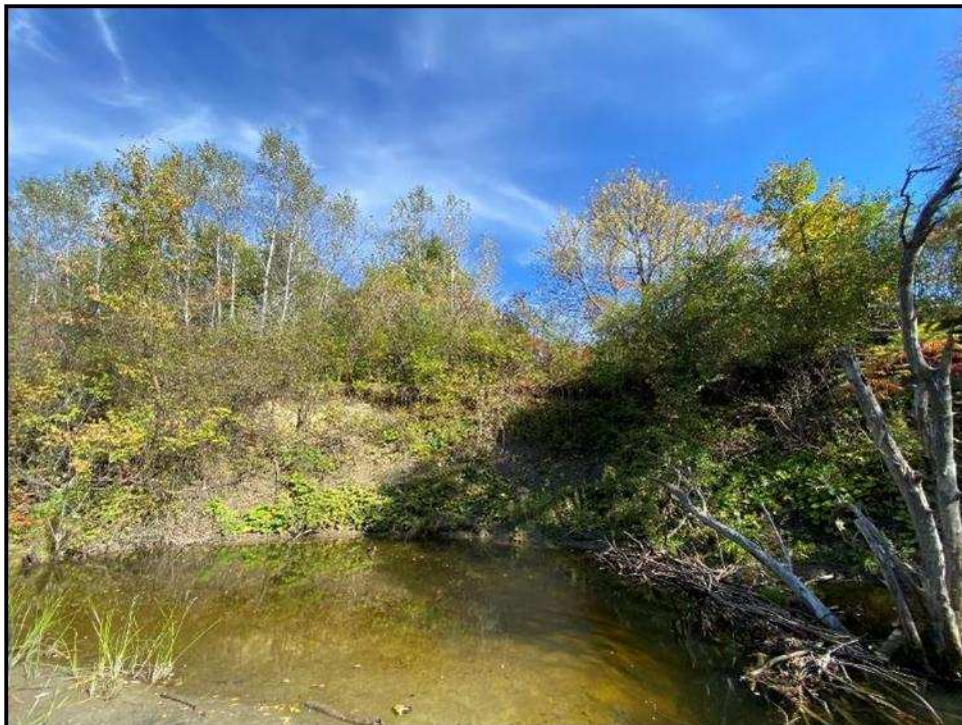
Photograph taken in a north direction illustrating the current state of the slope adjacent to the previously placed blast rock fill near the outlet of the concrete box culvert along the north bank of the tributary to the Rideau River.
